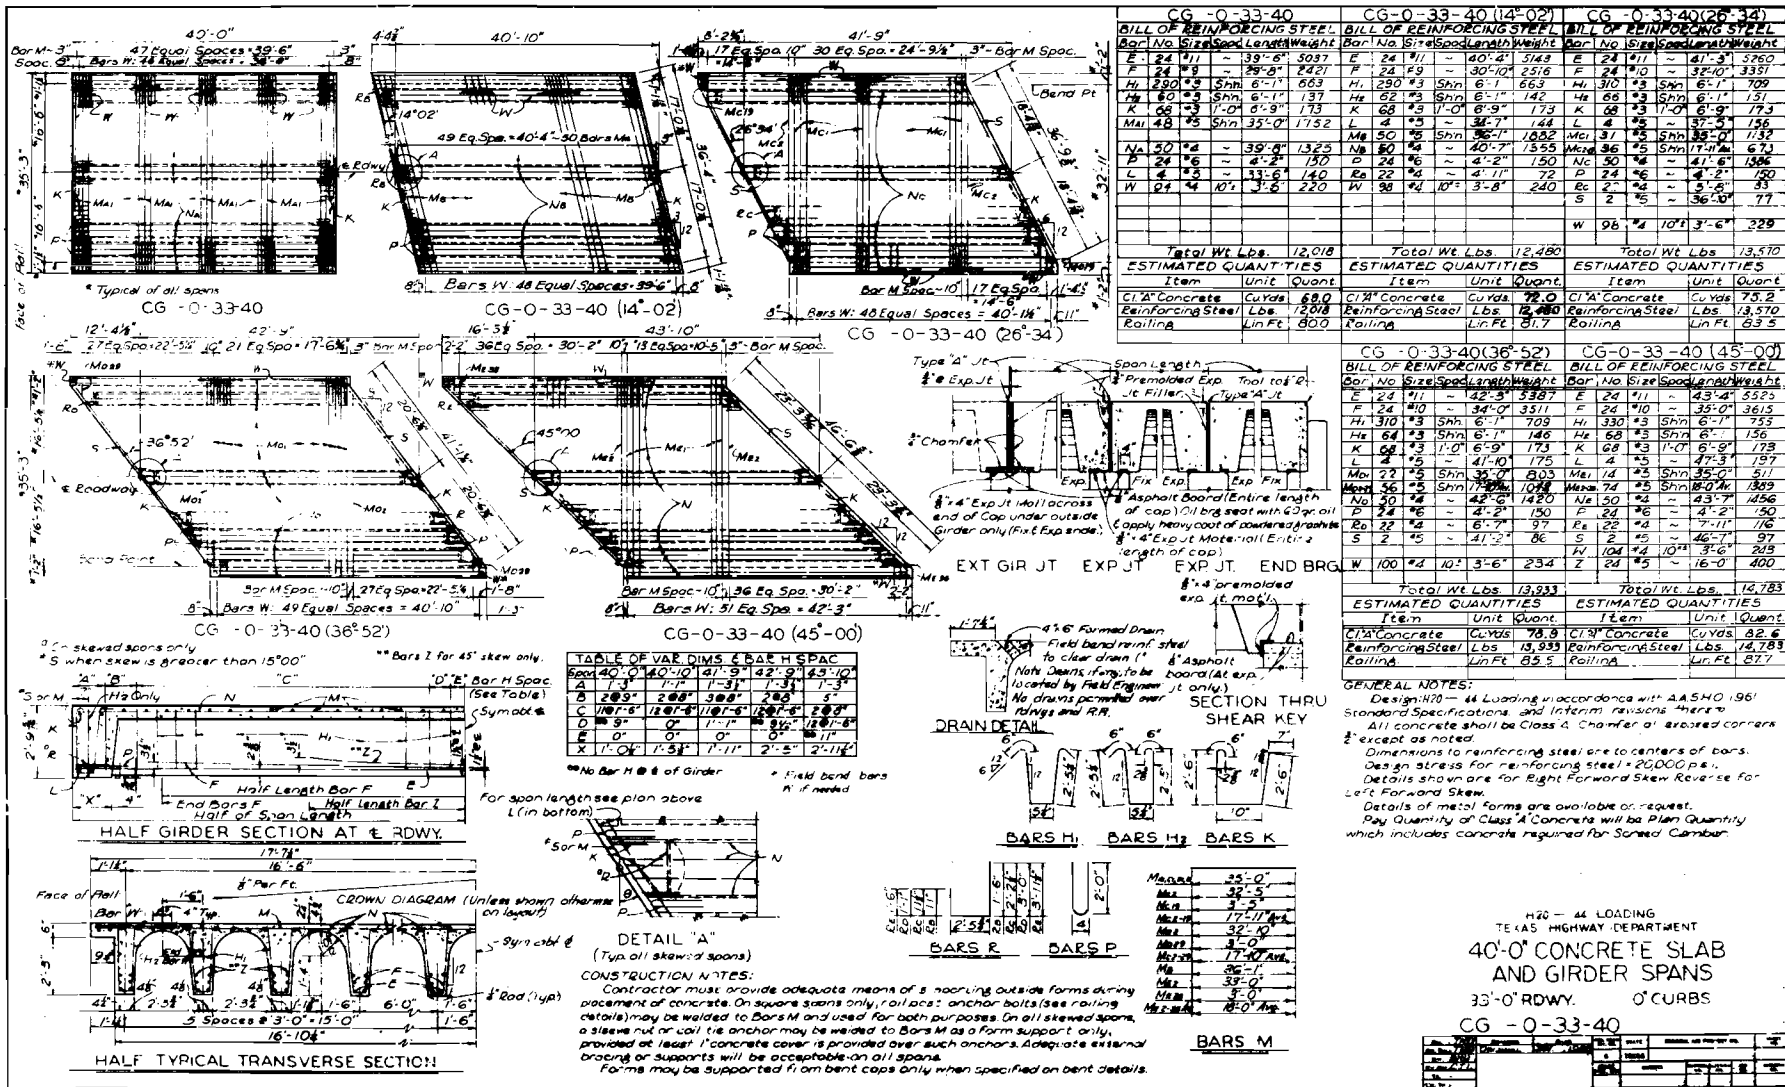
Texas Highway Department Plan Sheet, CG-0-33-40.
